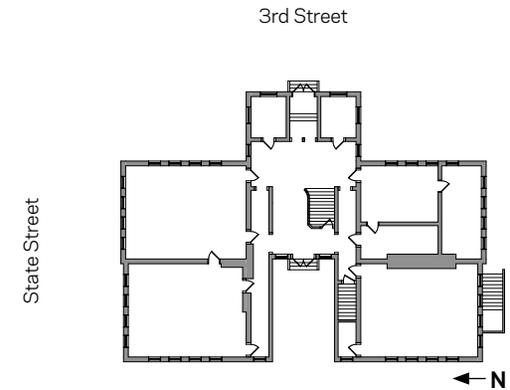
1872 plan following the completion of the northwest and southwest wings.
